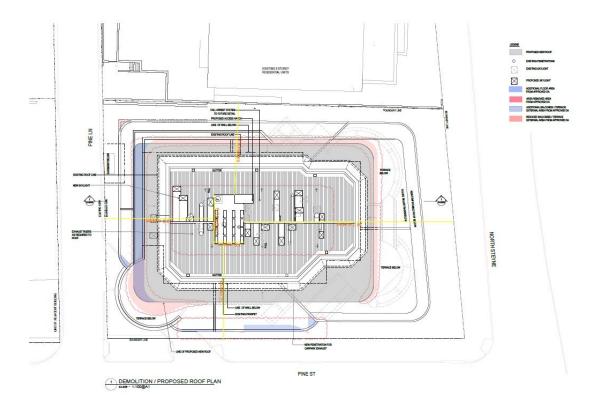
Roof plan indicating setbacks from mechanical plant screening to eastern, western, northern and southern boundaries.
